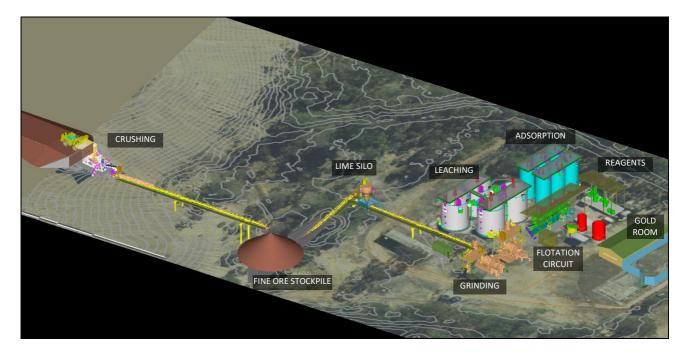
Aerial view looking towards the north and looking down on the preliminary processing plant layout utilising the former ROM pad and existing foundations.
